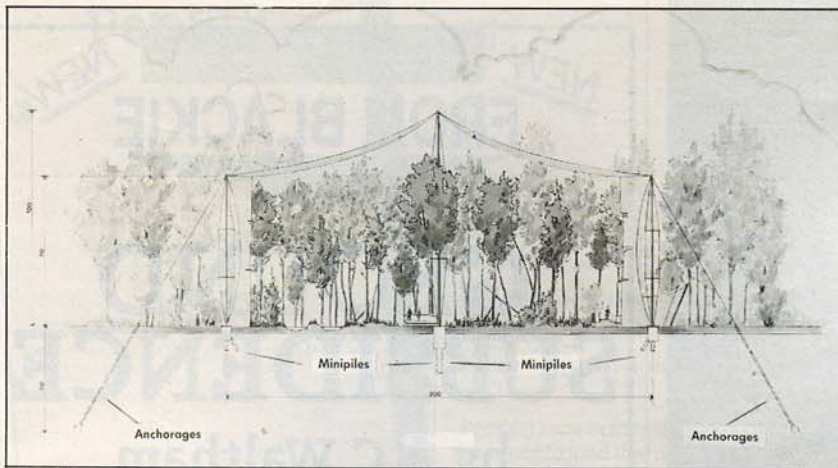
Artist's impression of the aviary in the cypress swamp, showing minipiles underpinning footings, and ground anchorages resisting tensile cable loads. Brookgreen Gardens, South Carolina.
